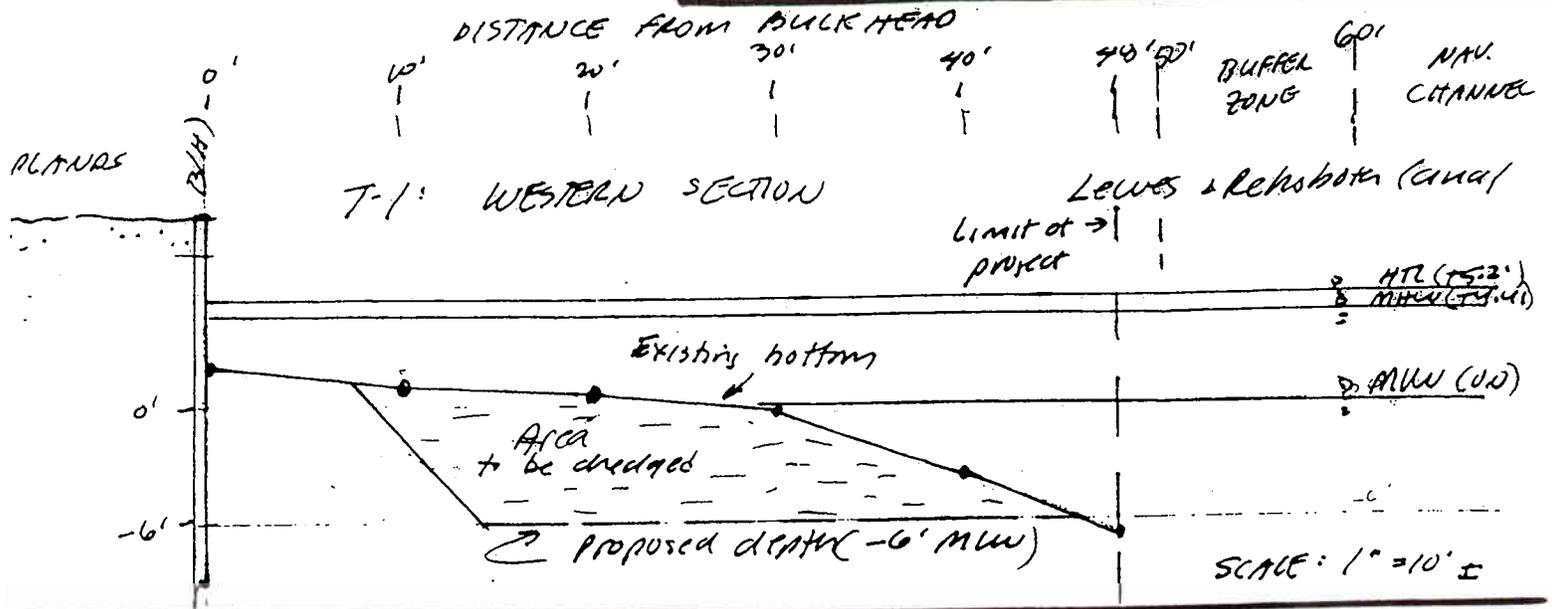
Revised cross-section sketches showing existing and proposed mean low water
